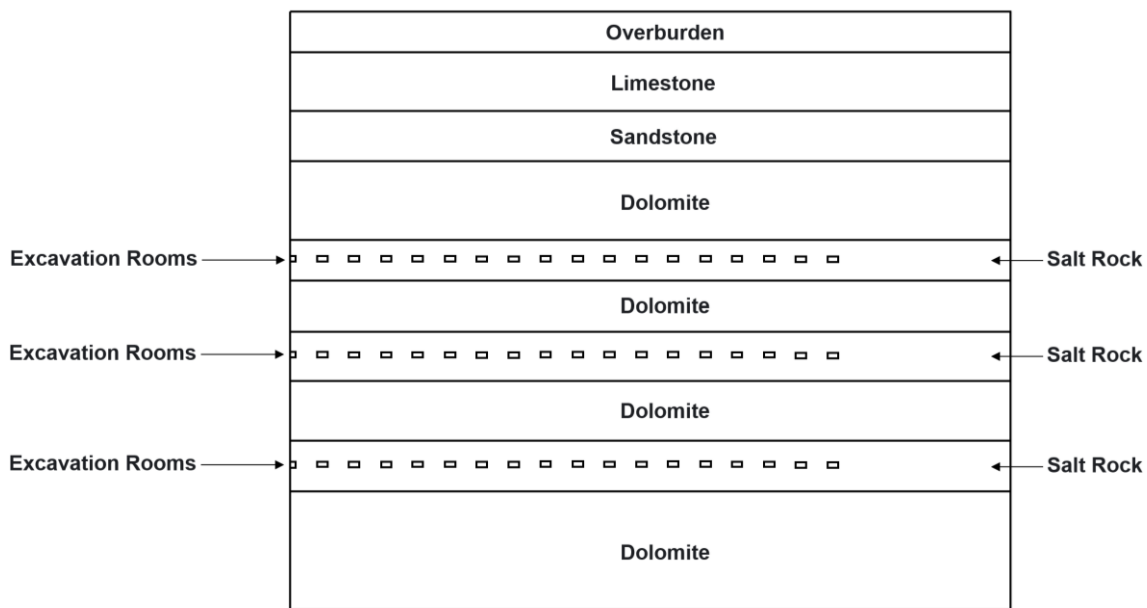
Stratigraphy and room-and-pillar excavation layout (front view)
